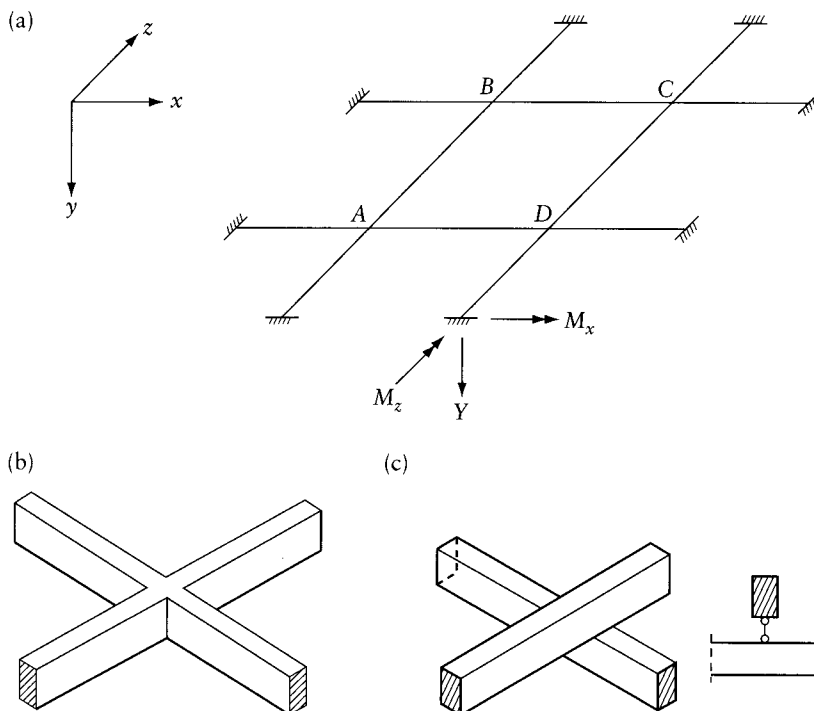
Statical indeterminacy of a grid. (a) Grid. (b) Rigid connection of beams. (c) Hinged connection of beams.
